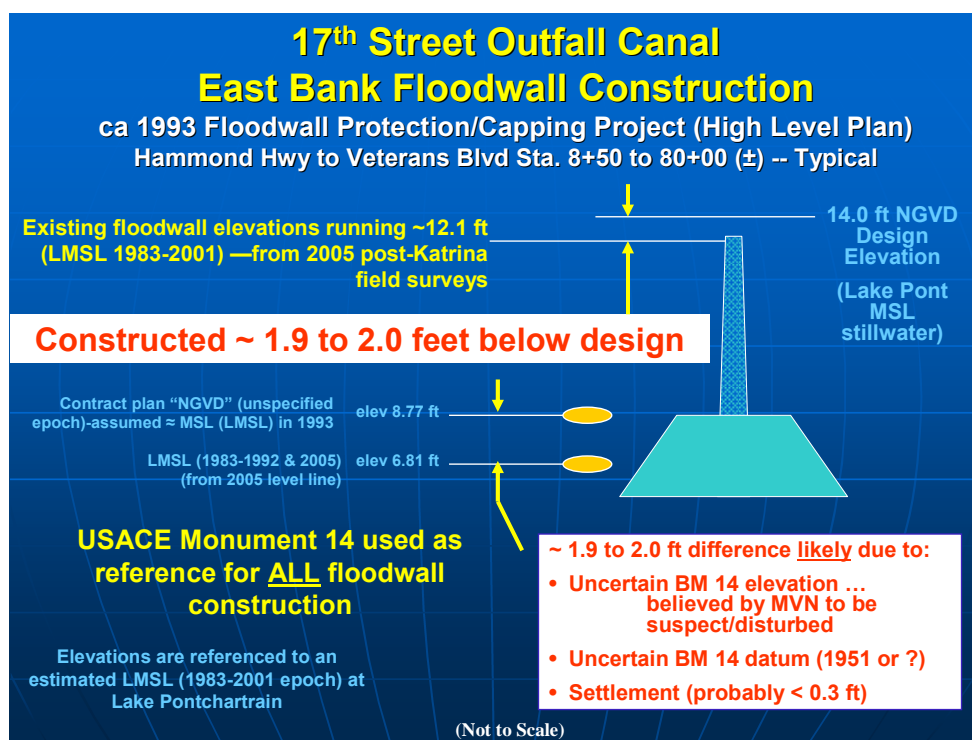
17th Street Canal Floodwall Elevations—inconsistencies between geodetic and water level reference datums
